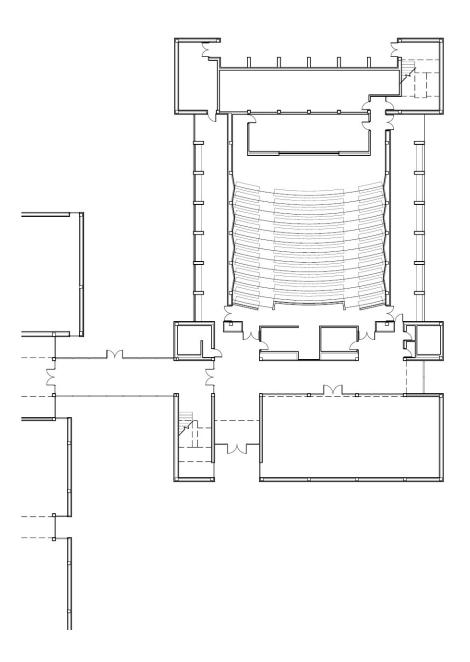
Antecedental Context - First Floor Plan - Part 2
